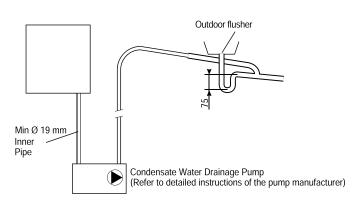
Typical Connection Method of a Condensate Water Drainage Pipe (refer to detailed instructions of the pump manufacturer)
